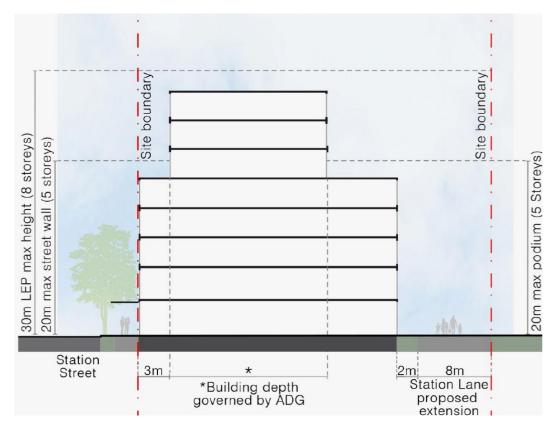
Amalgamated Site 7 - Typical North-South Section
